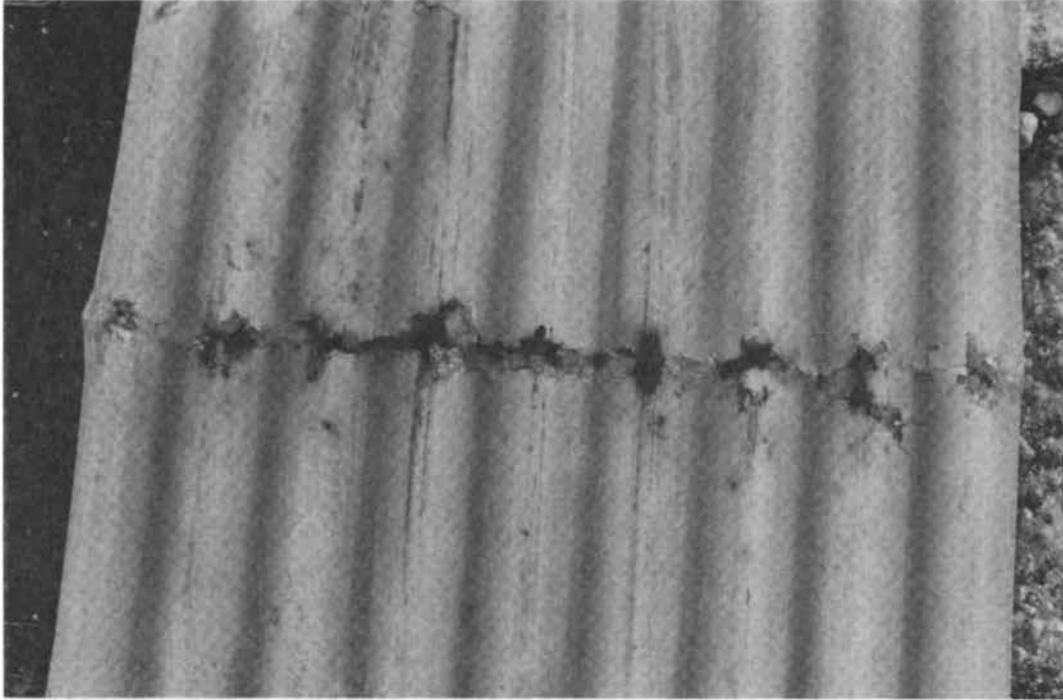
Light-gage corrugated metal sheeting (note sheeting has rusted through along fastener line).
